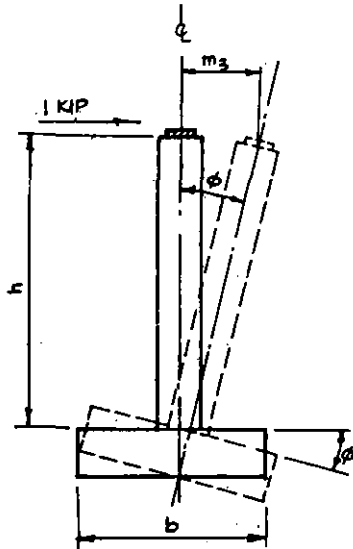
Rotation of footing caused by horizontal force at top of support (Example 3A)
